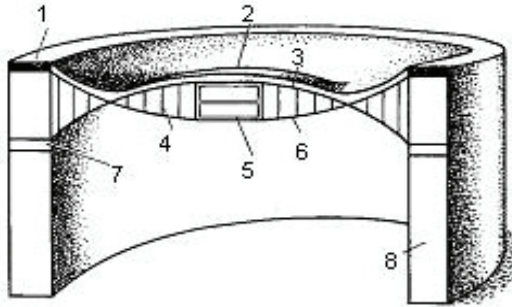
Location of the cables [6] 1. Reinforced concrete ring 2. Roof covering, 3. Bracing cable, 4. Braces, 5. Cylinder, 6. Suspension cable, 7. Steel ring, 8. Internal cylindrical wall.
